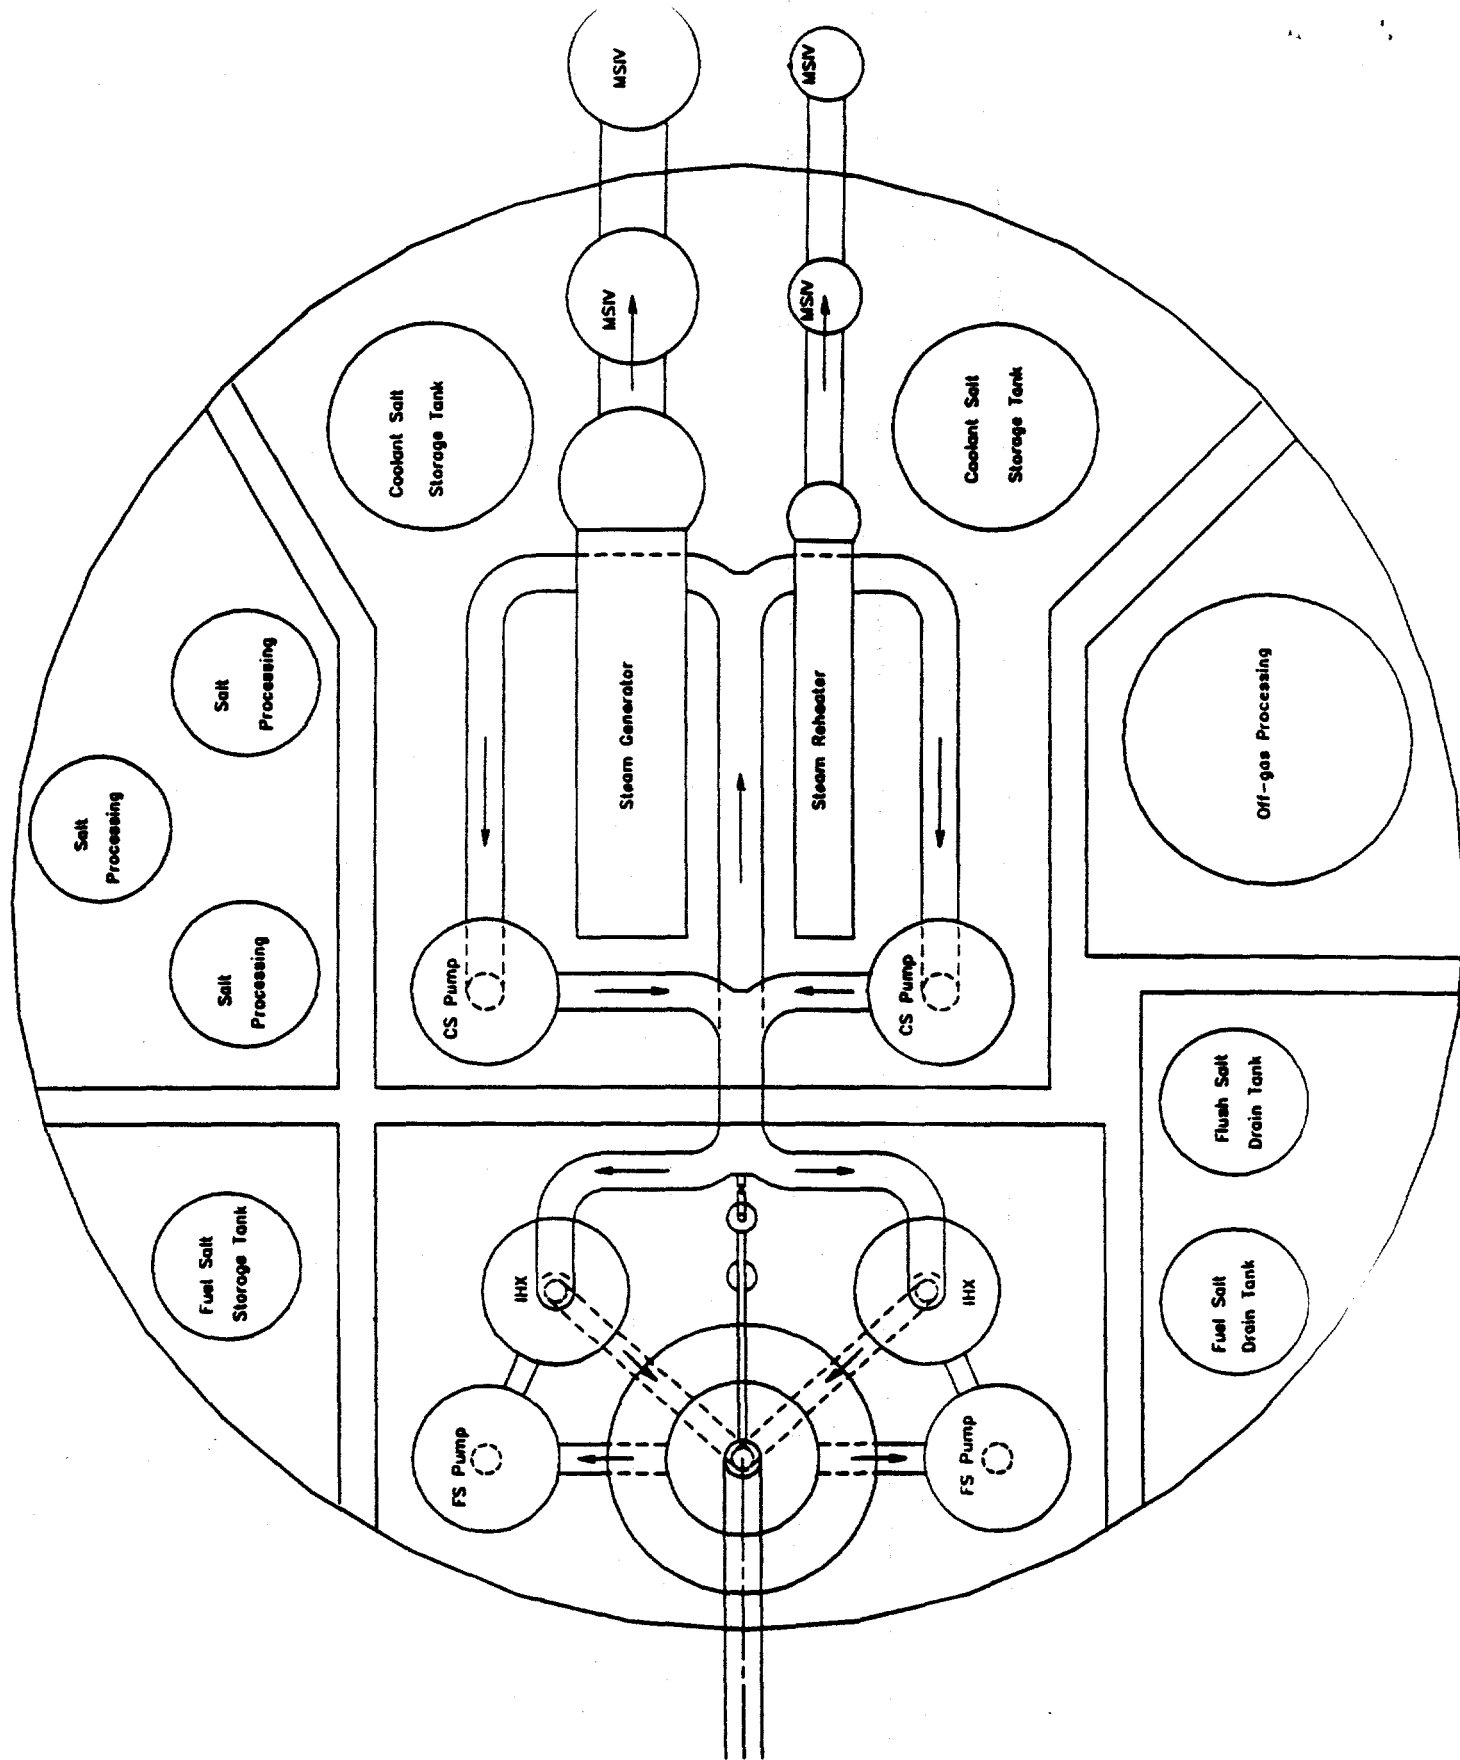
C. Plan and elevation views of ABC plant layout: Plan view.
